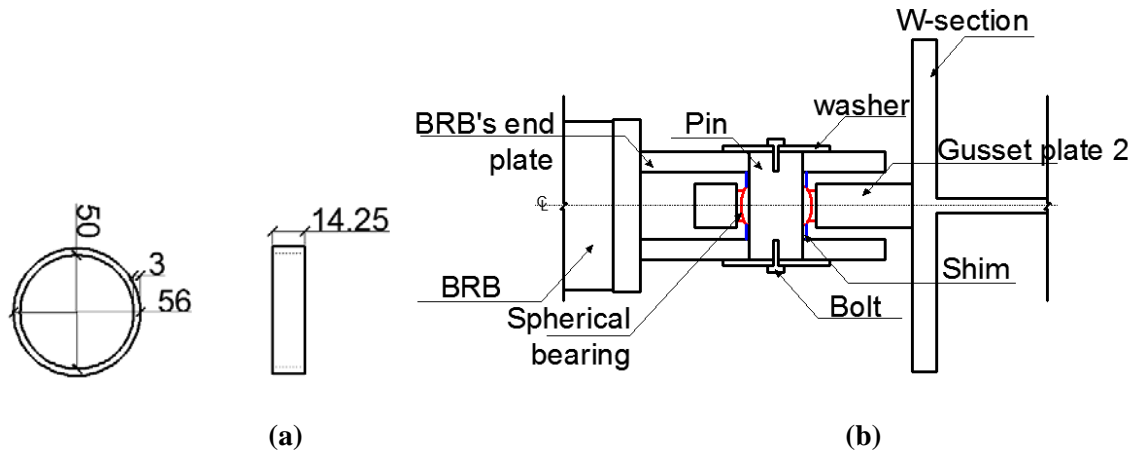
(a) Dimensions of shims that were used to keep the BRB connection centered (unit:mm); (b) Connection details of BRB-2 with gusset plate-2 in the reaction block
